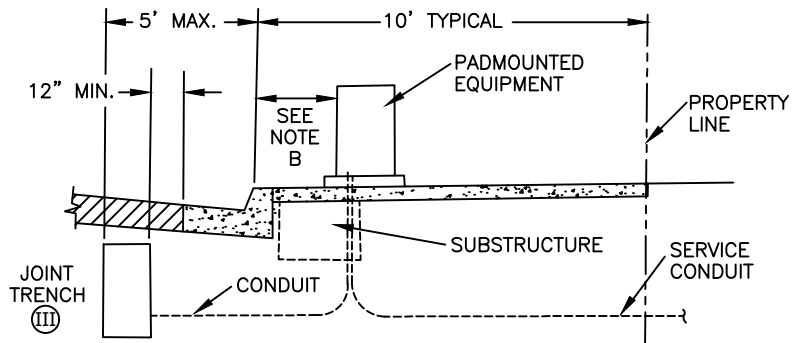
SIDEWALK NEXT TO CURB AND PROPERTY LINE
